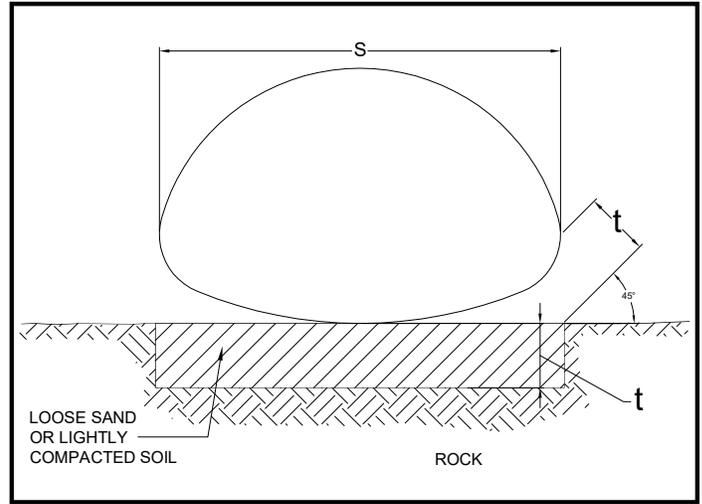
Method of handling rock foundations. $t = 1/2''$ per foot of fill over structure, with 24'' the maximum.
